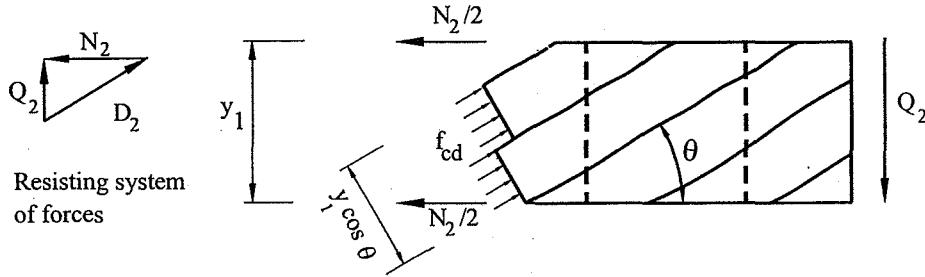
Wall of the space truss-diagonal compressive stresses
